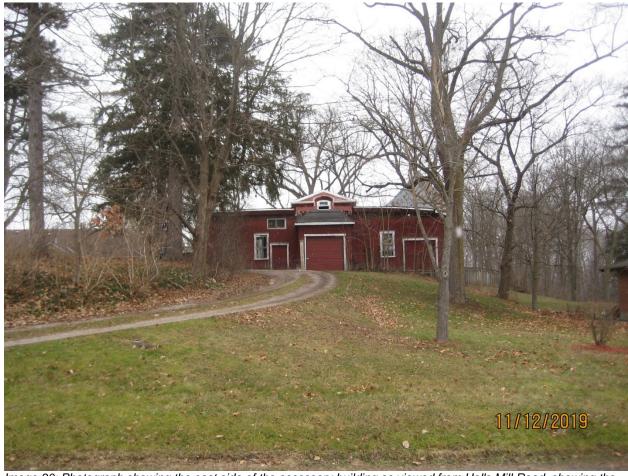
Photograph showing the east side of the accessory building as viewed from Halls Mill Road, showing the collapse of the roof framing, December 11, 2019.
